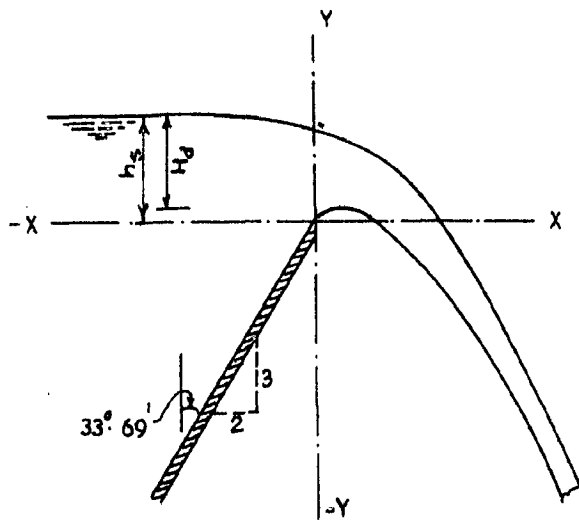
WEIR INCLINED DOWN STREAM ON 2:3 SLOPE
